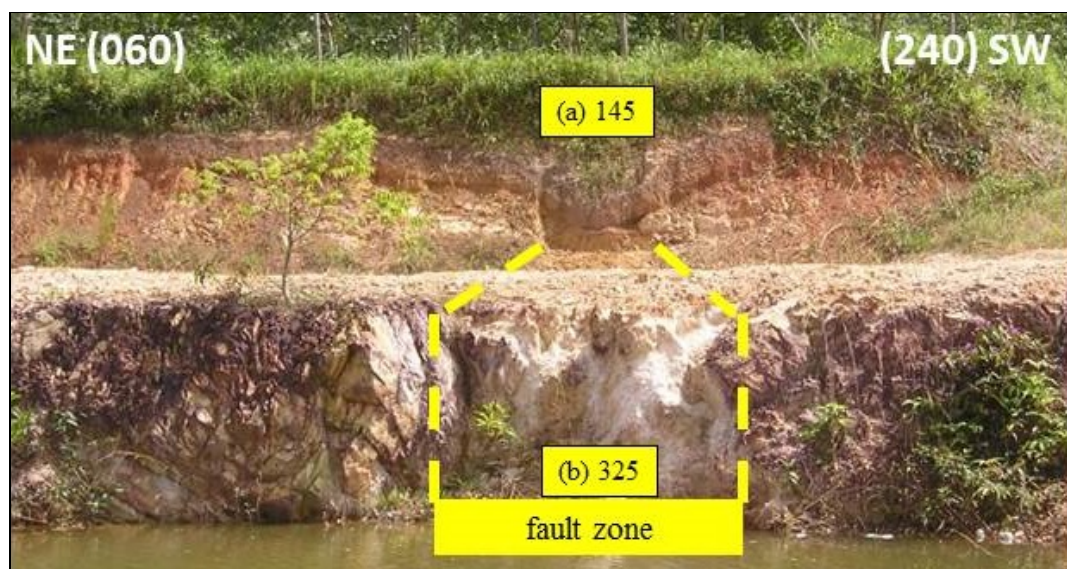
Fault zone at V1 site which has a strike direction of 145-325. a) outcrop at the pit wall, b) outcrop at the pond level below and about 15 away from a).
